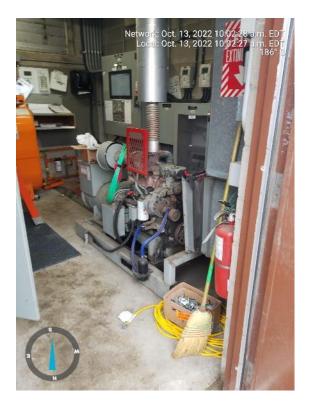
View of Finch SPS control building and temporary generator from south of Finch Ave W, facing southeast.
